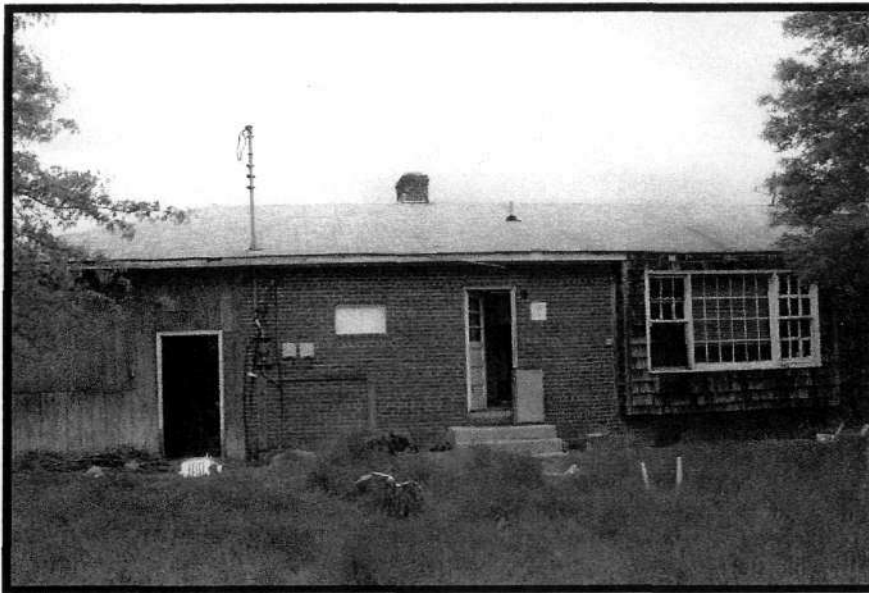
15504 Crain Highway. Rear Façade. View to the West.
